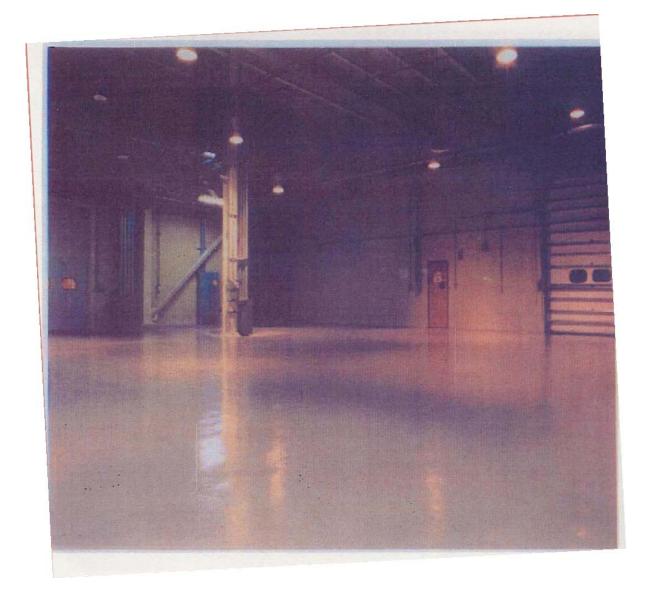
NE Corner of CH Bay of the Waste Handling Building
